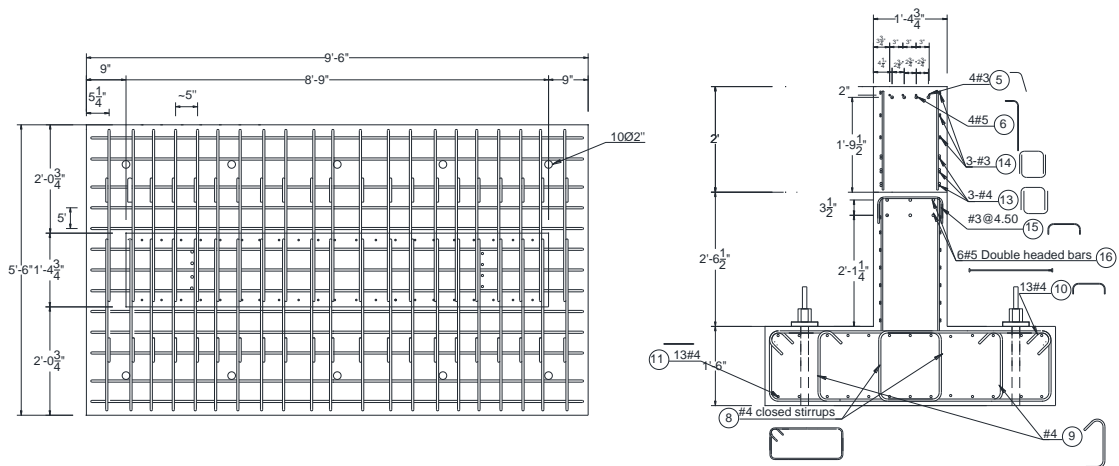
Sections E-E (left) and F-F (right) in design drawing for Specimen 7 (see Figure 5.1 for the location of the sections)
